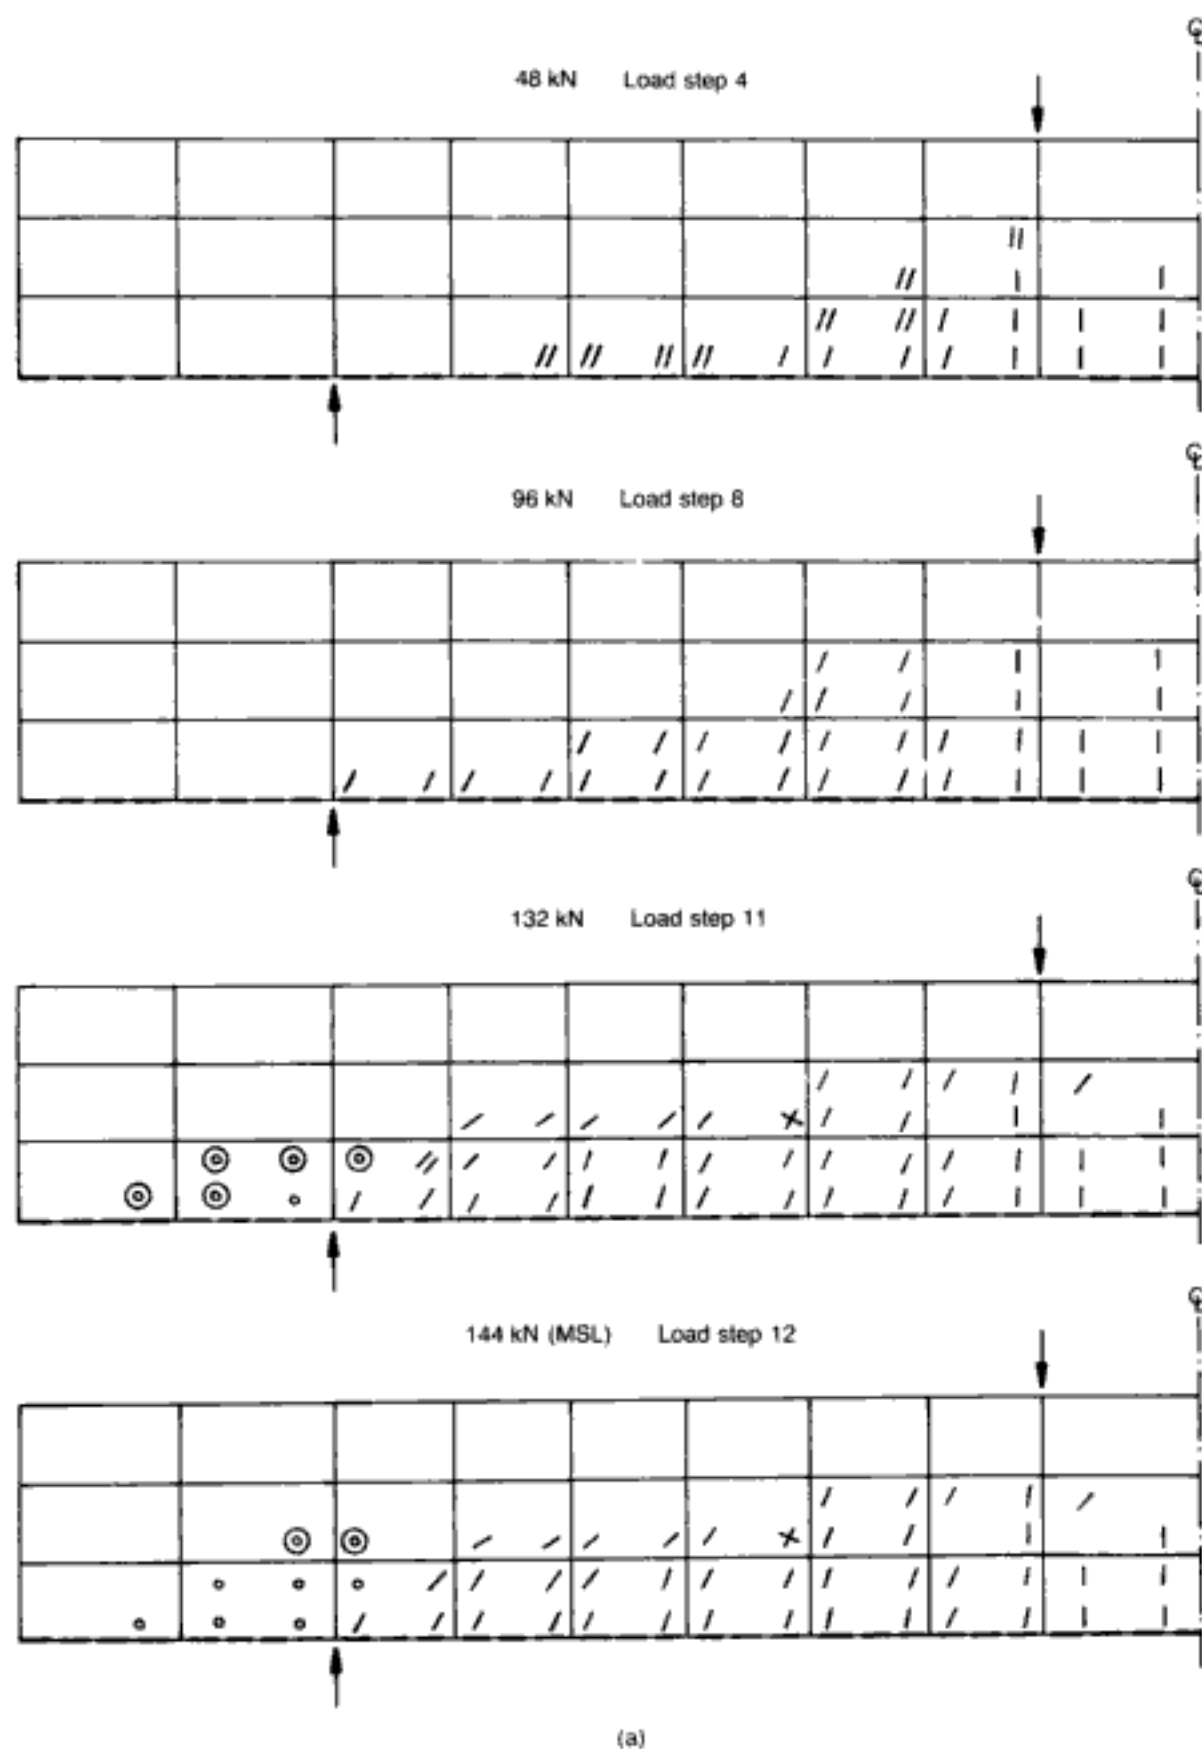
(above and facing). Typical crack patterns for group A beams (non-symmetrical cracking) at various load stages.¹⁸⁶ (a) without stirrups (beam D4); (b) with stirrups (beam D4s)
